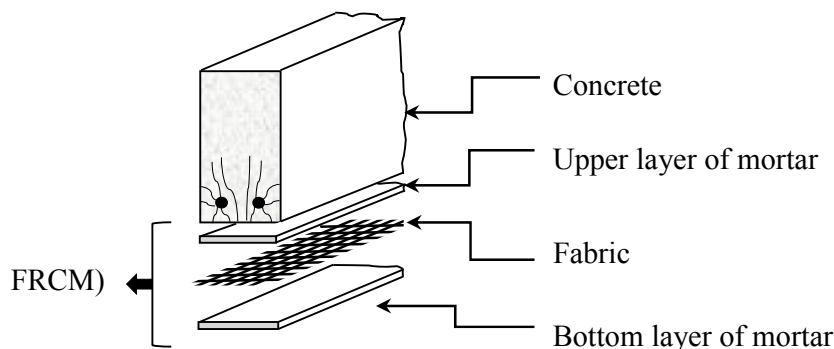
Schematic Representation of FRCM for Strengthening Concrete Structures
